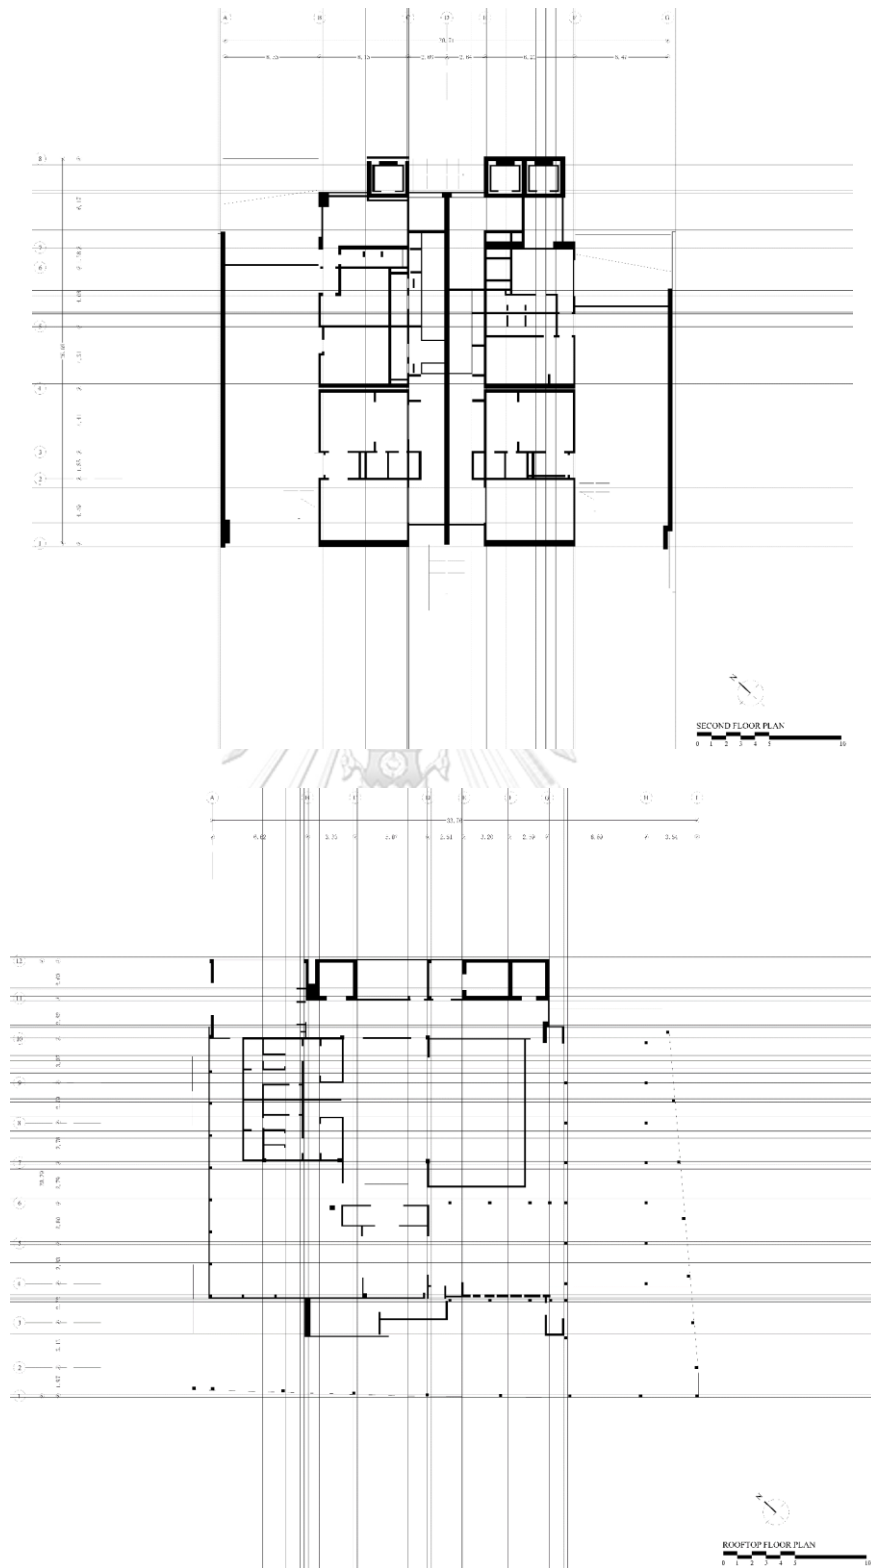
Second floor plan (residential plan) and rooftop plan of WINDSHELL Naradhiwas, redrawn by the author.
